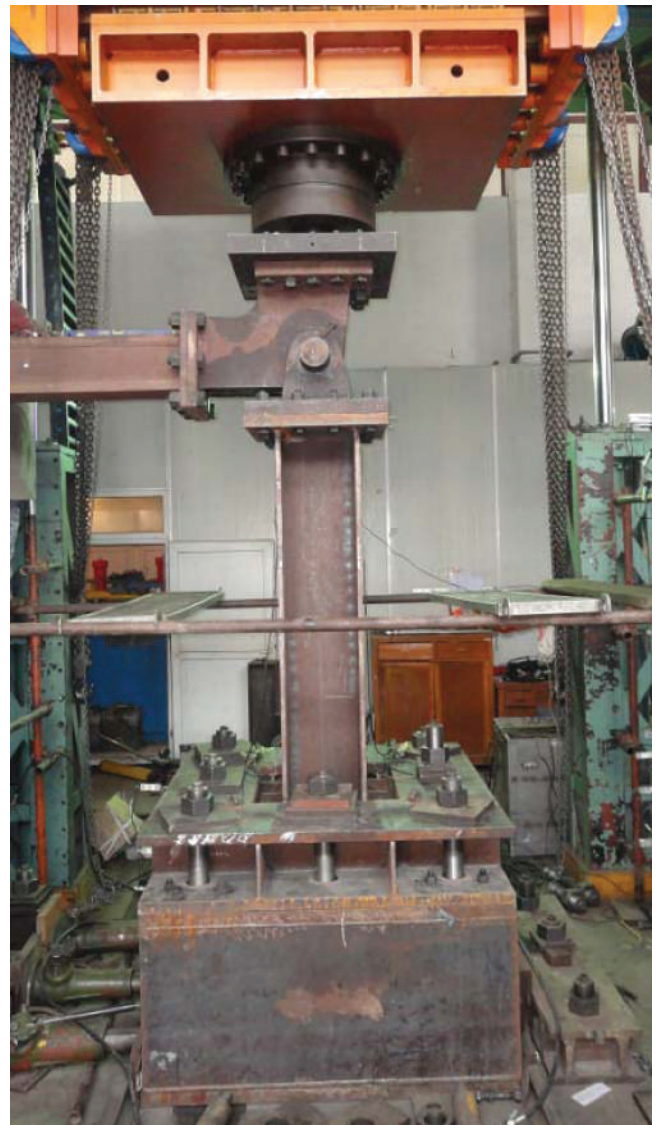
Testing for seismic behavior of welded H-shape column. (Photo courtesy of Professor G.-Q. Li)
